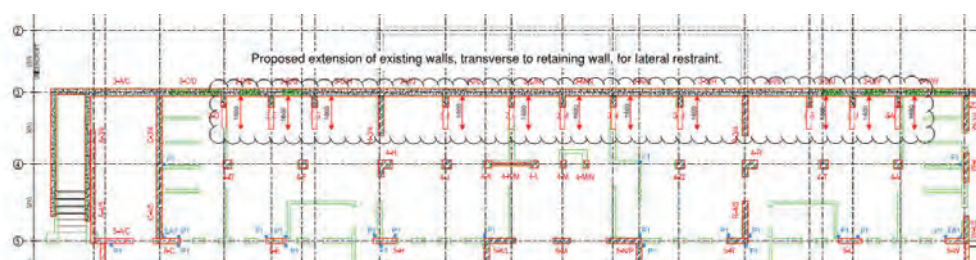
indicative bracing required to resist earth generated lateral forces.
